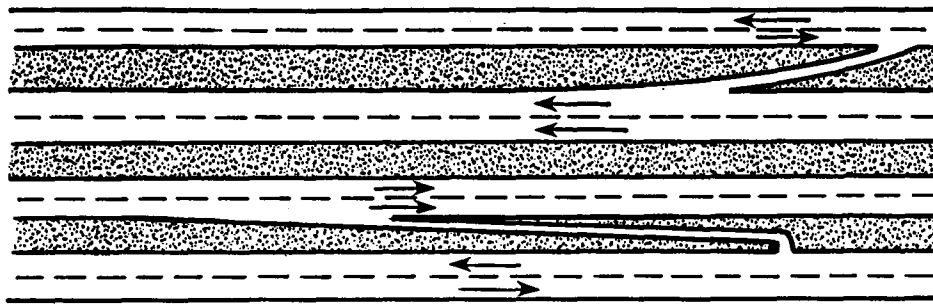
Existing Two-way, Two-lane Frontage Roads
